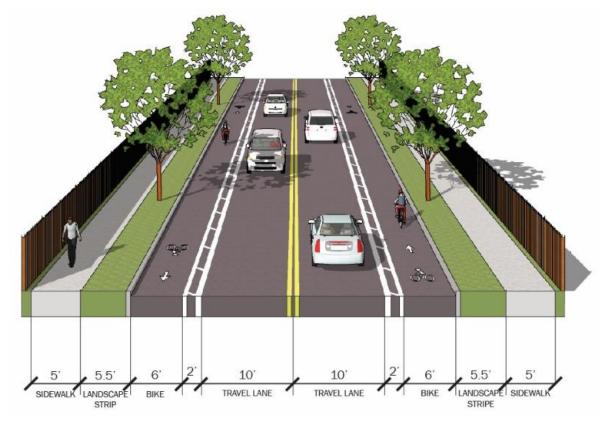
Proposed Collector Cross Section with Narrowed 10-Foot Travel Lanes
